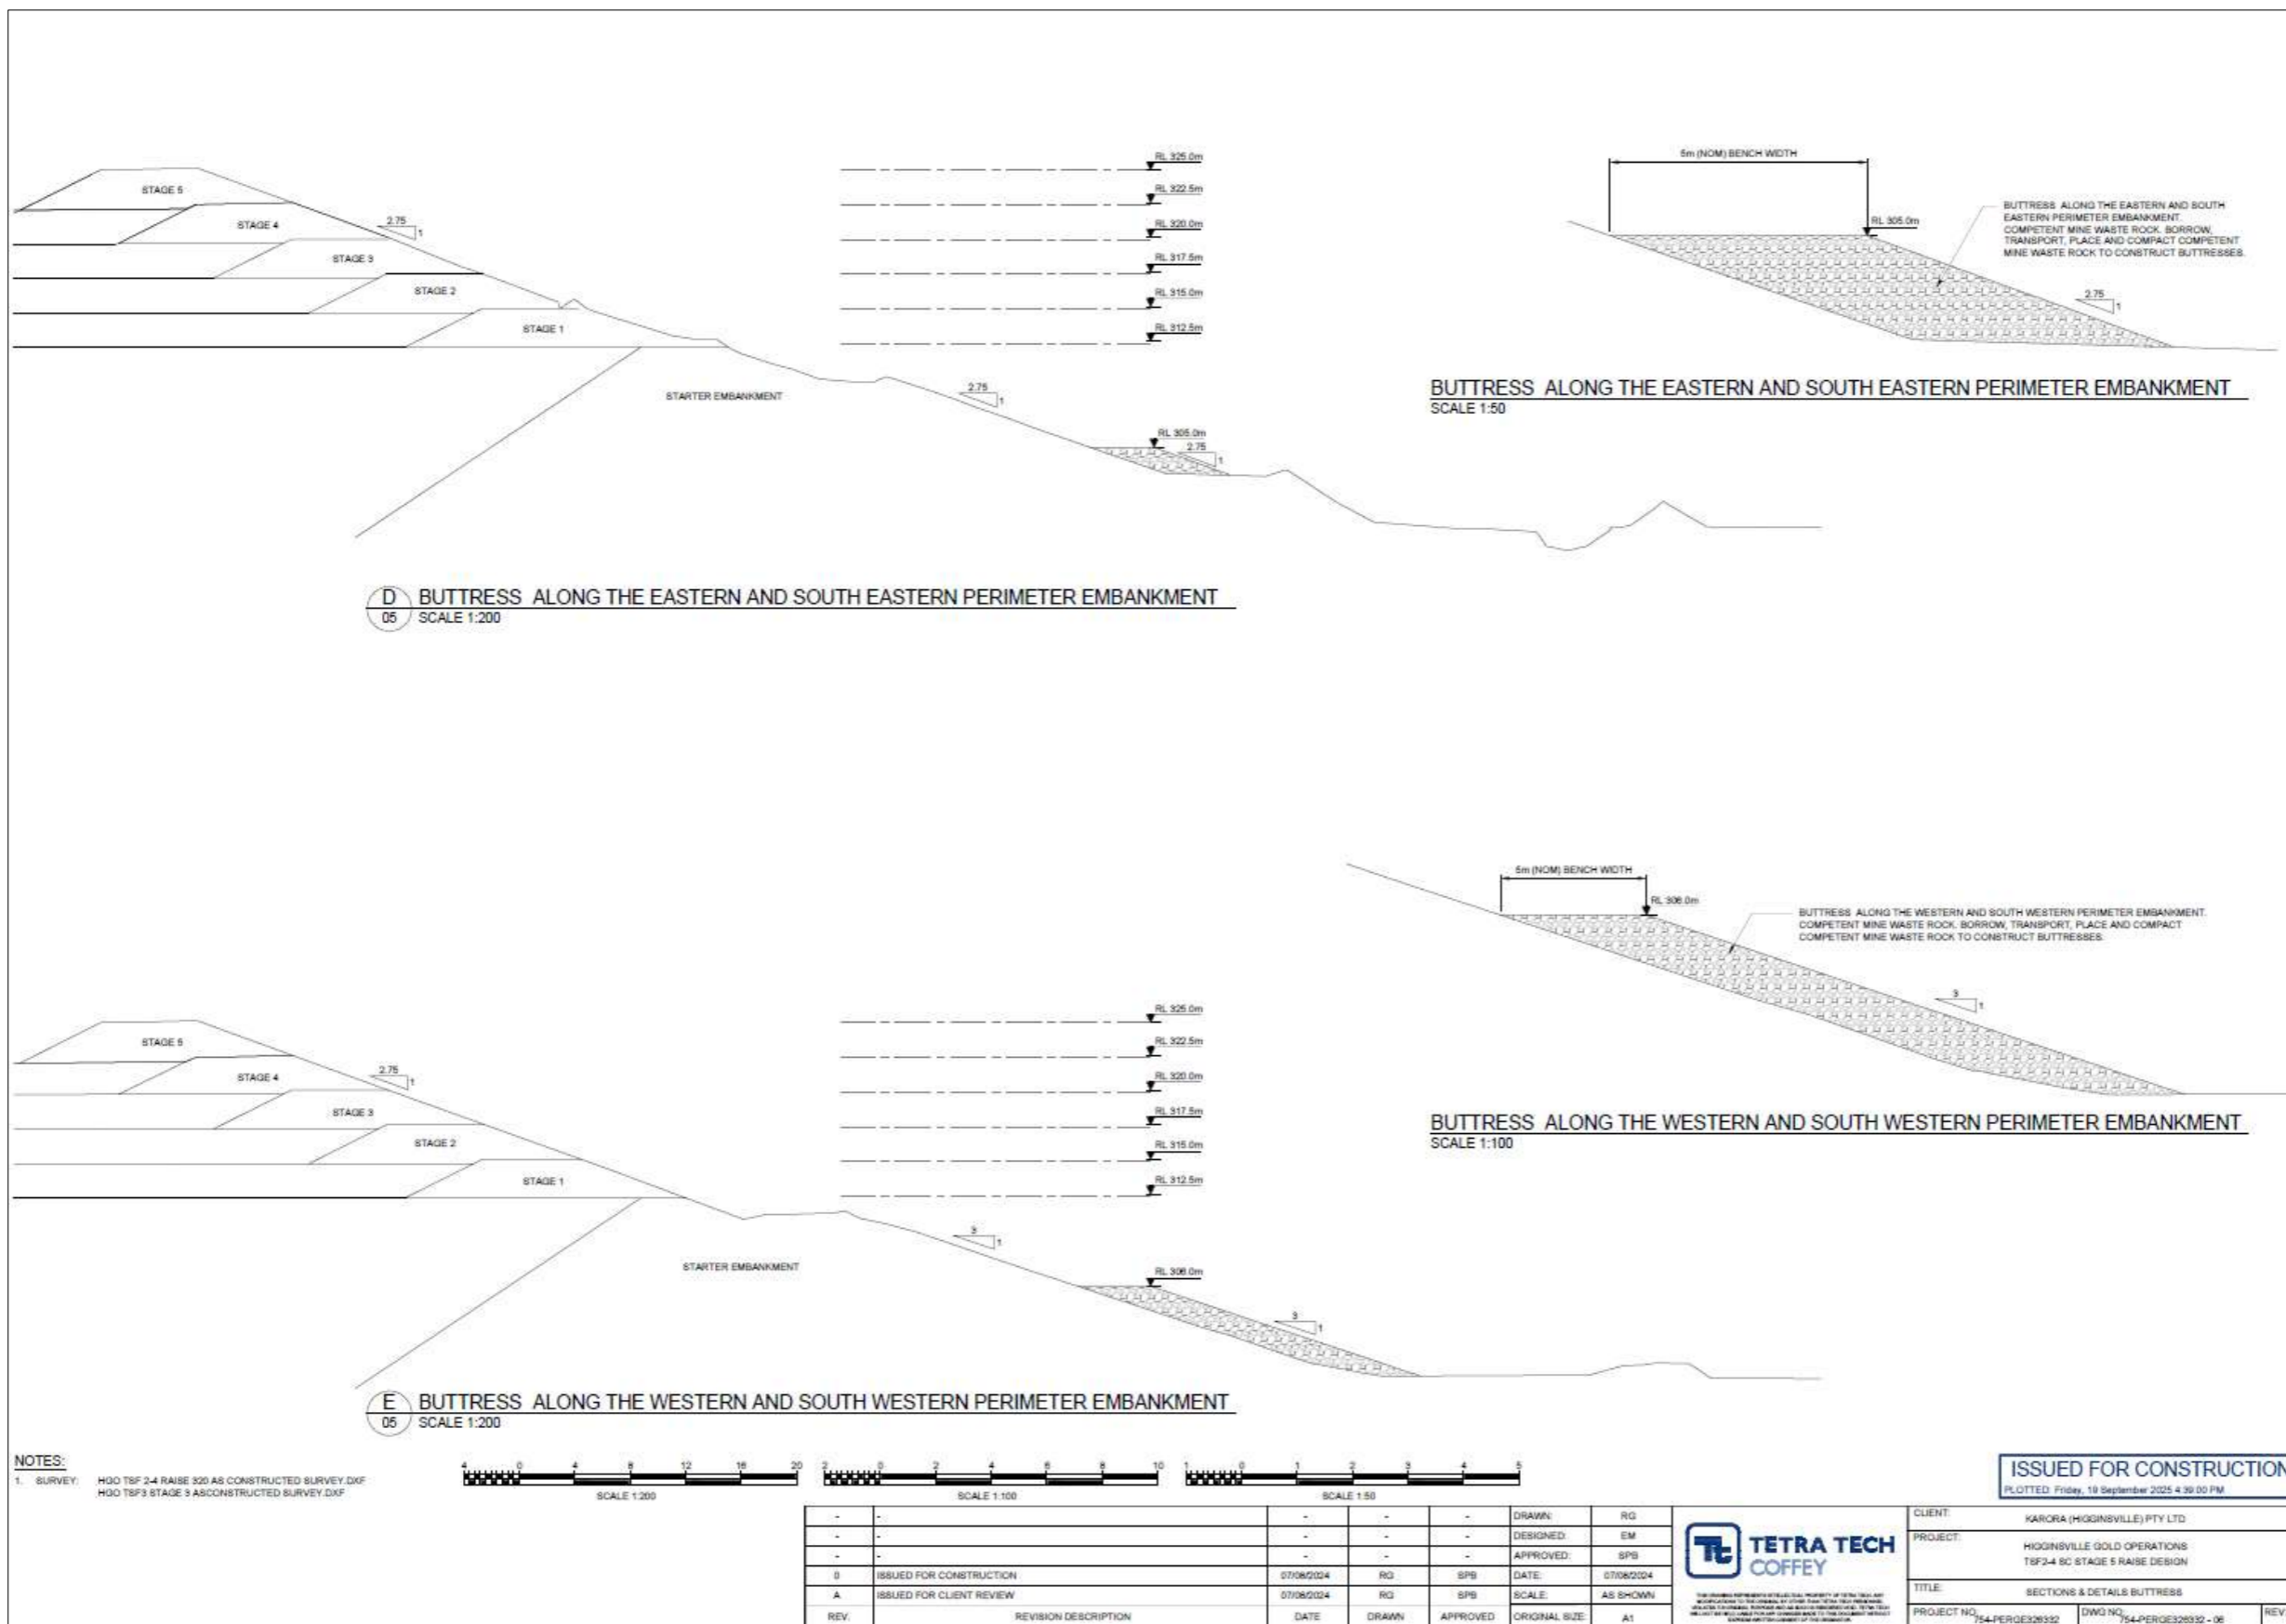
TSF2-4 Stage 1-5 embankment raise profiles and buttress details
